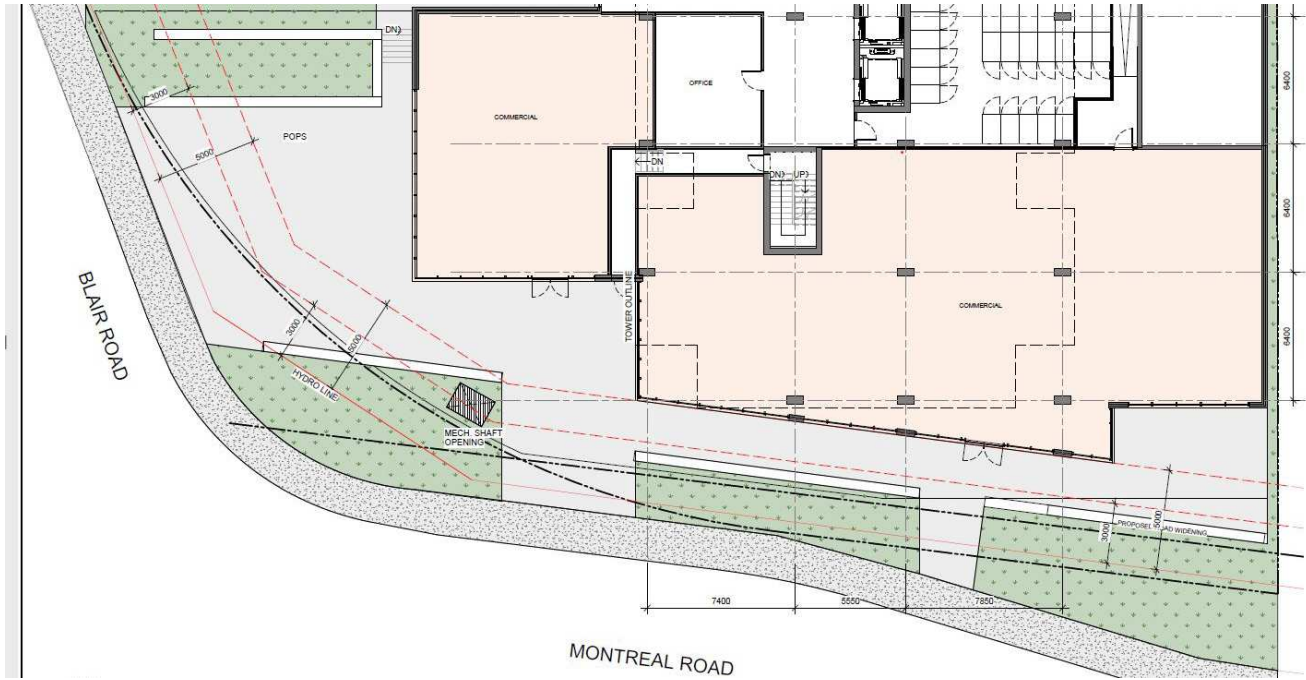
Revised podium articulation and amenity space fronting Montreal Road.
